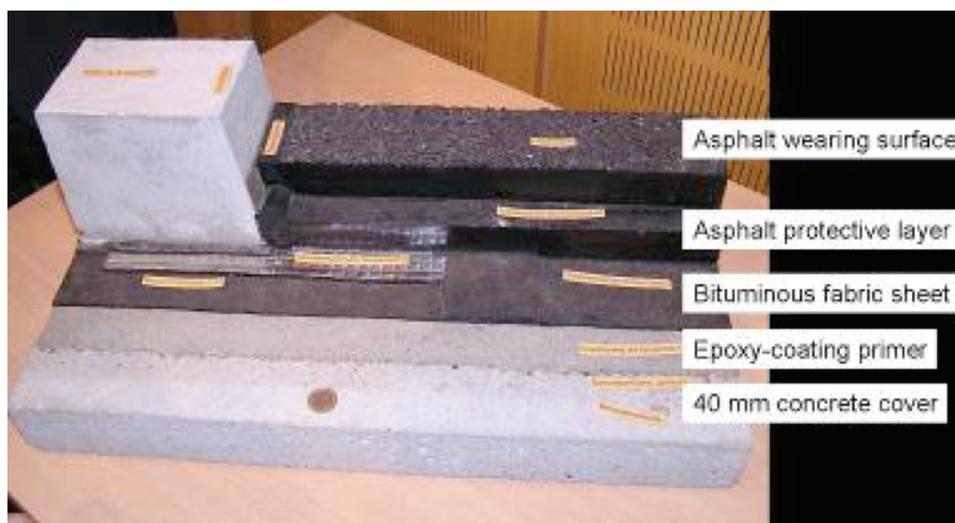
Bridge deck multiple-level corrosion protection system.
